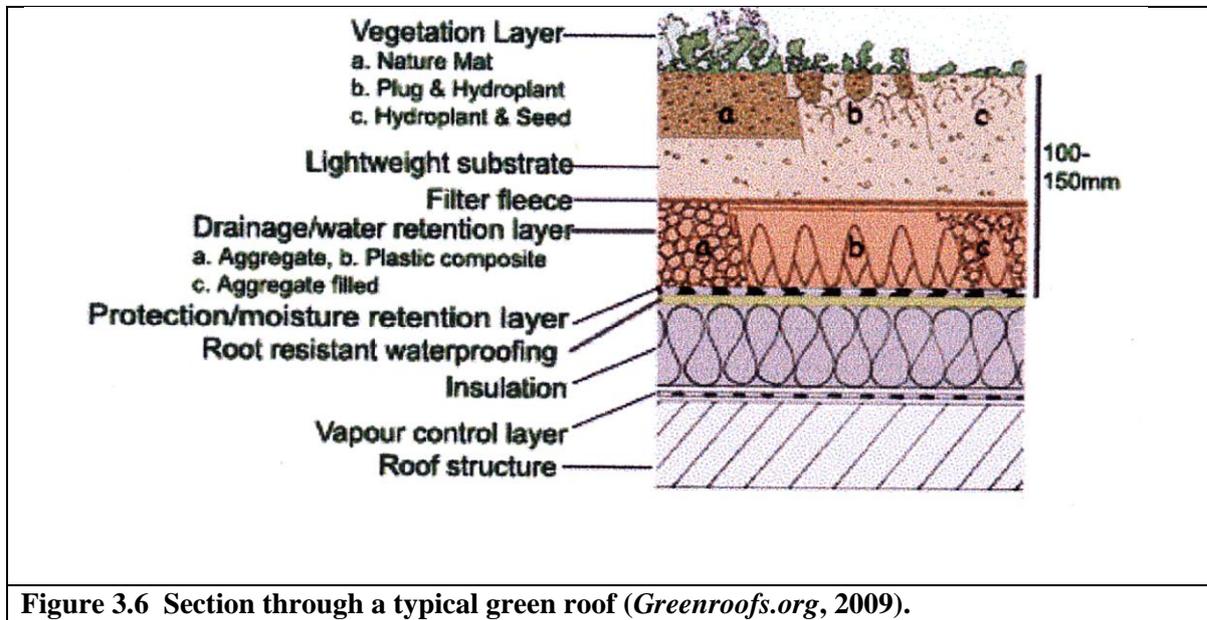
Section through a typical green roof (*Greenroofs.org*, 2009).
